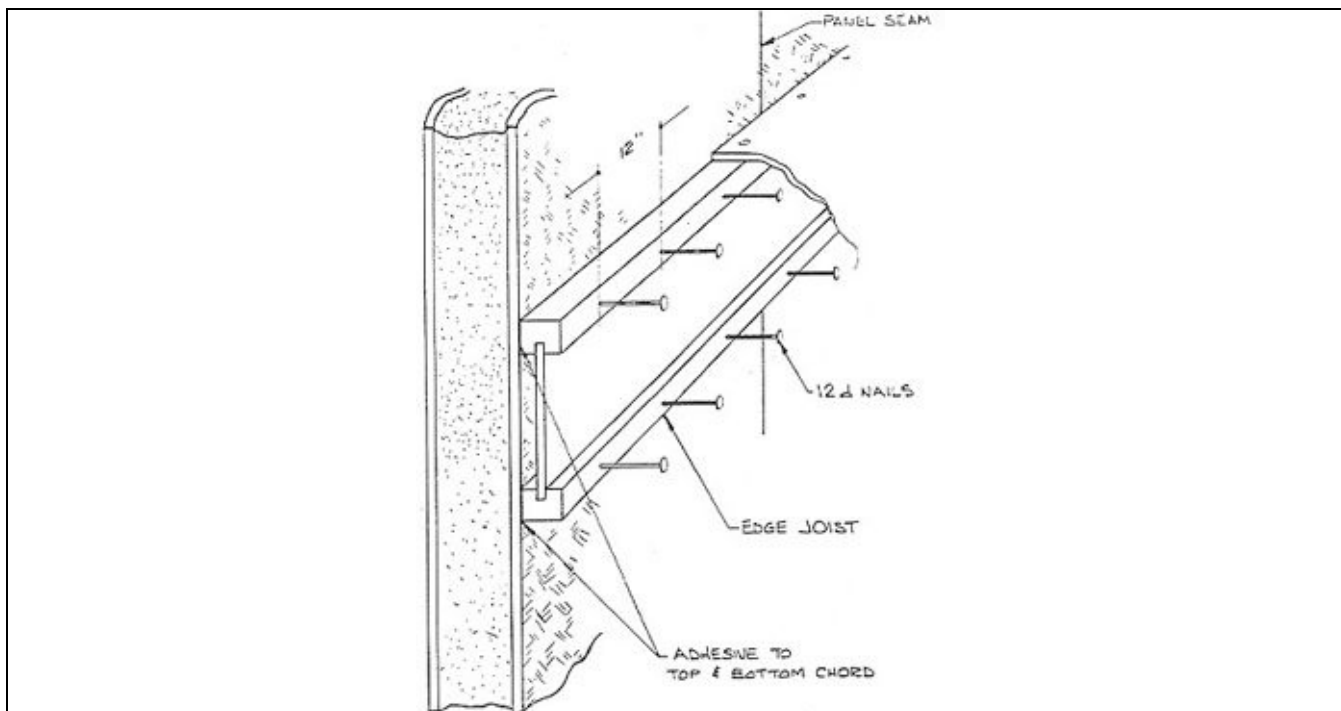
Securing Edge Joist to Sidewall: Glue and nail the edge joists to the wall panels at both the top and bottom to prevent deflection of the floor at the wall edge.
